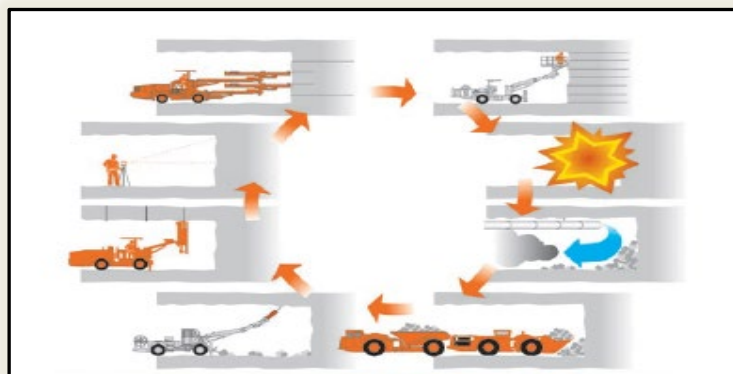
Drill and Blast Cycle (Rock Excavation Handbook, pg 216)
